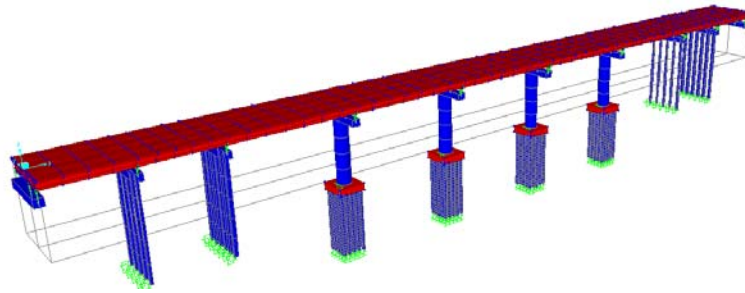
The finite element model of the No. 127.9 Bridge on U.S. Highway 61
